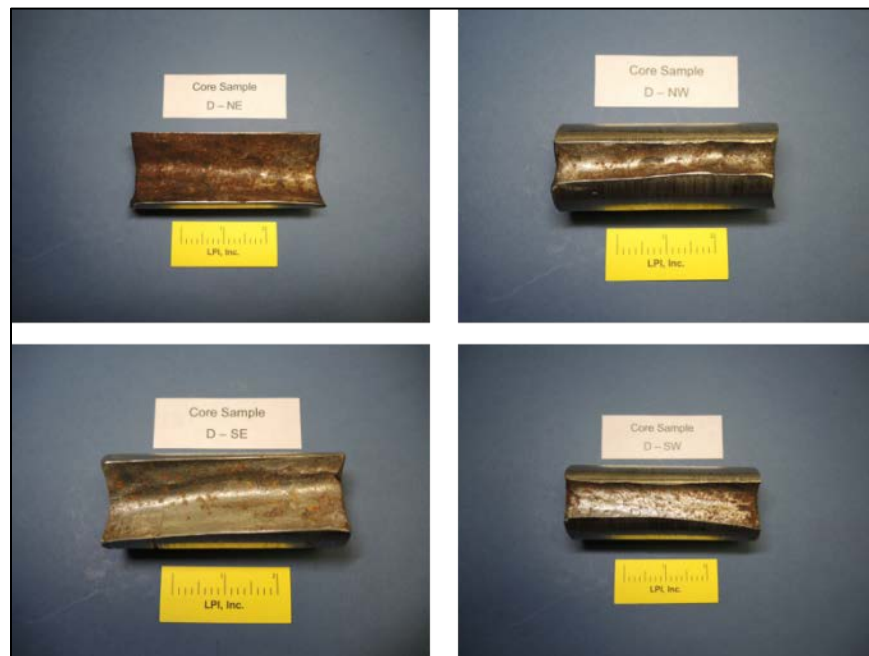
Flange core samples from the north girder above First Street (Girder D) in the as-received condition.
